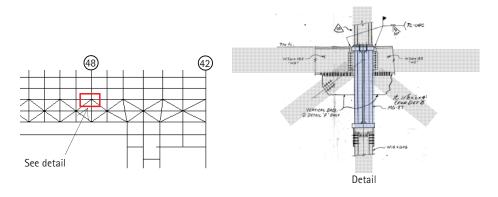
Detail from Frankel Steel erection drawing E119 showing discontinuity of perimeter belt truss members at connection to deep cantilevered girders (north elevation)
